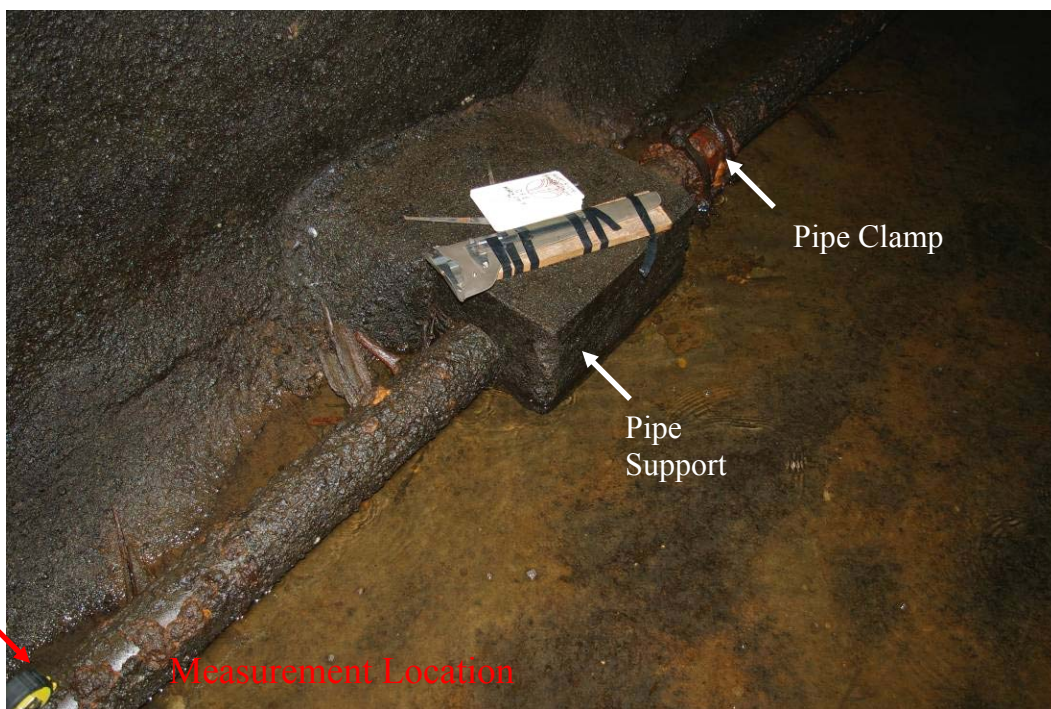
(August 15, 2007) East Supply Tunnel – Drain pipe measurement Location #2 (1.2 m upstream from third pipe support).
